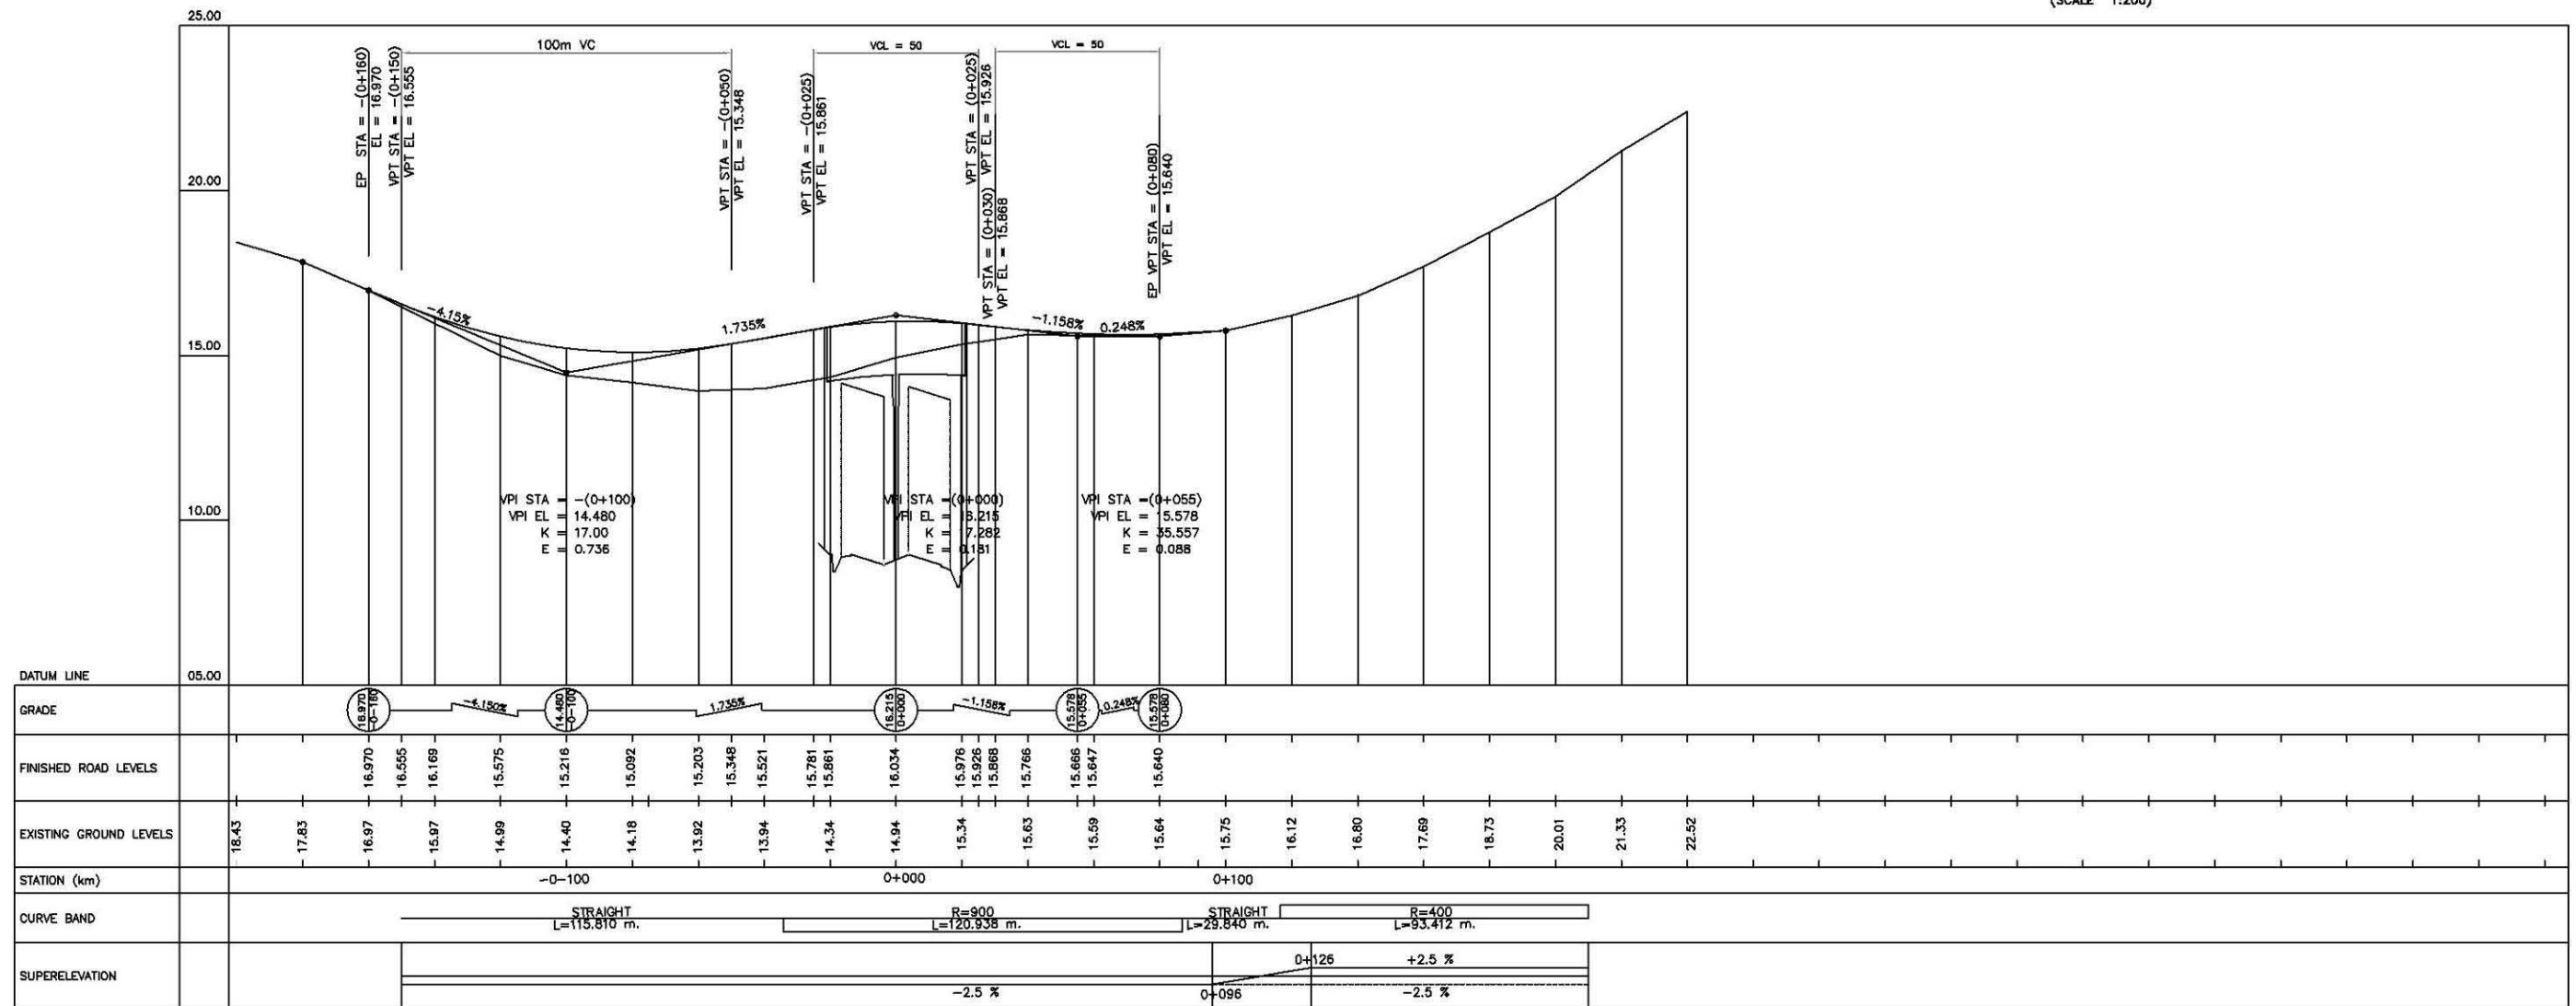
Proposed Plan for Improvement of Malambe - Kaduwela Road (Opt.1)
